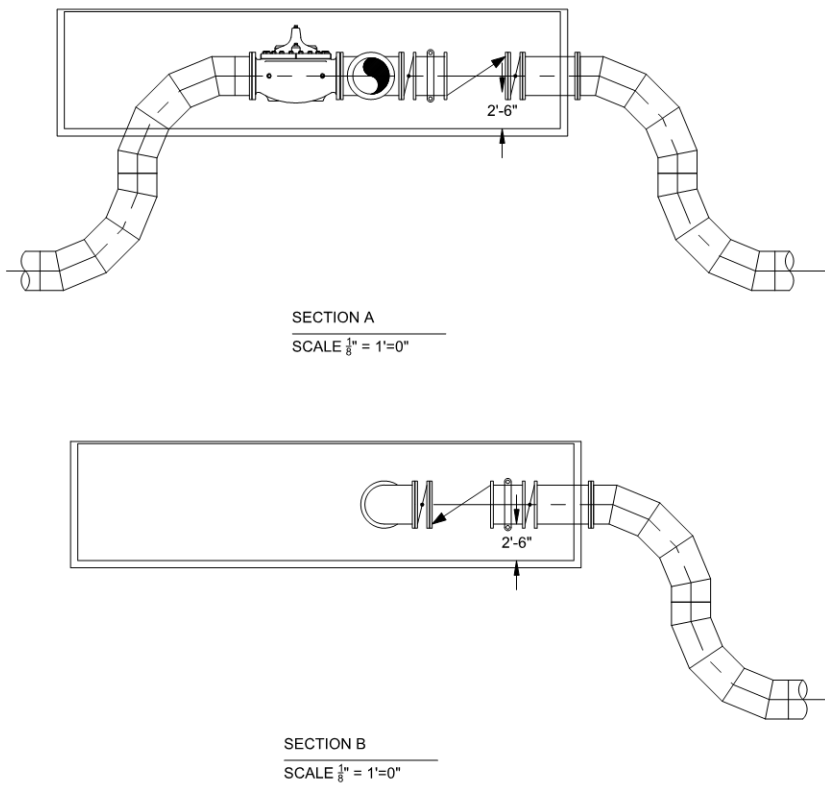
Inlet/Outlet Piping Valve Enclosure (Sections)
